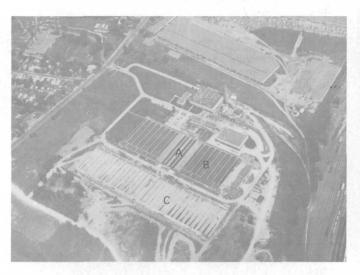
Low-altitude oblique photograph (1980) of sewage treatment plant undergoing additional construction, St. Louis, Mo.
